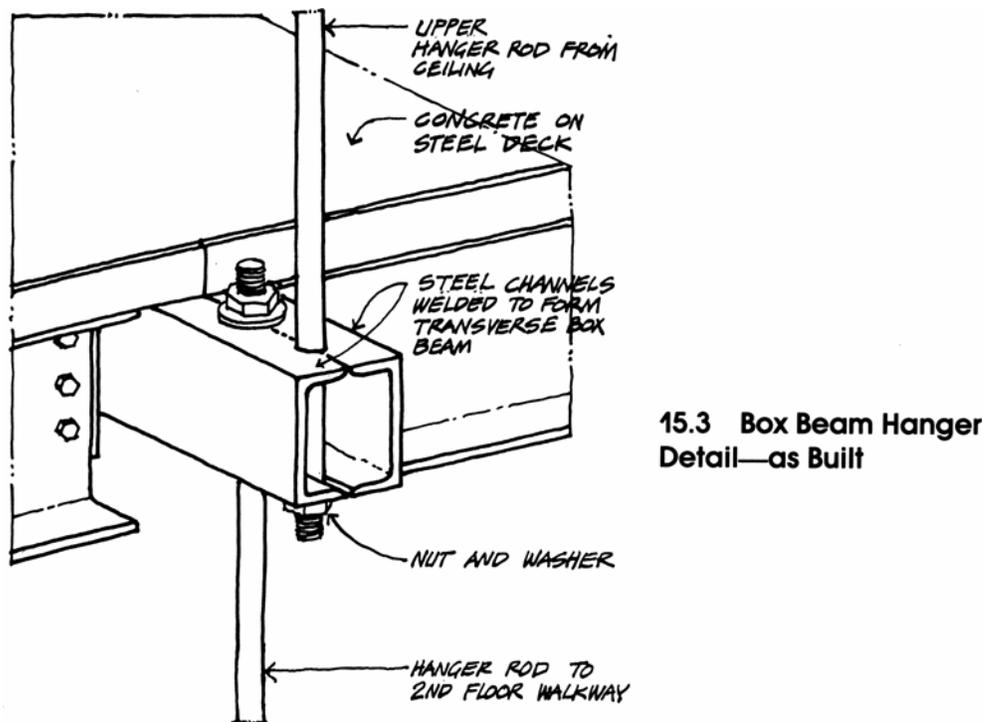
Box beam hanger as built. (Source: Levy, Matthys and Salavori, Mario. (1992): *Why Buildings Fall Down*, W. W. Norton & Company, New York).
